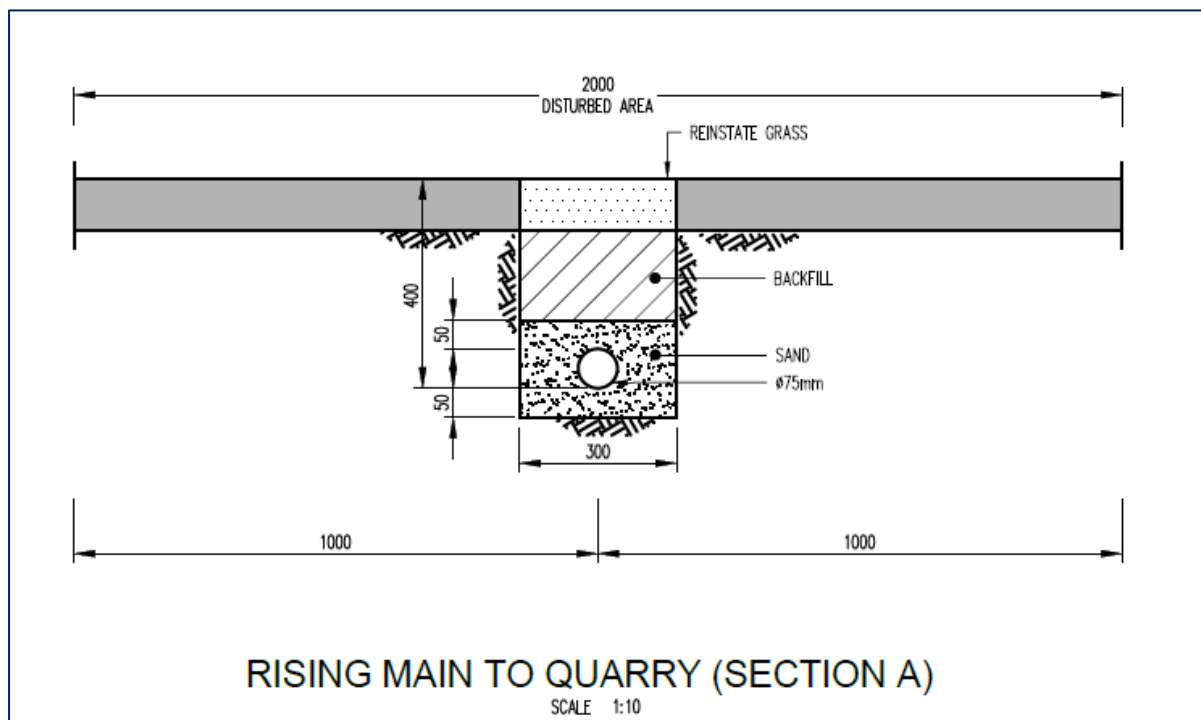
| Trenching corridor (Source: Applicant's documentation)
